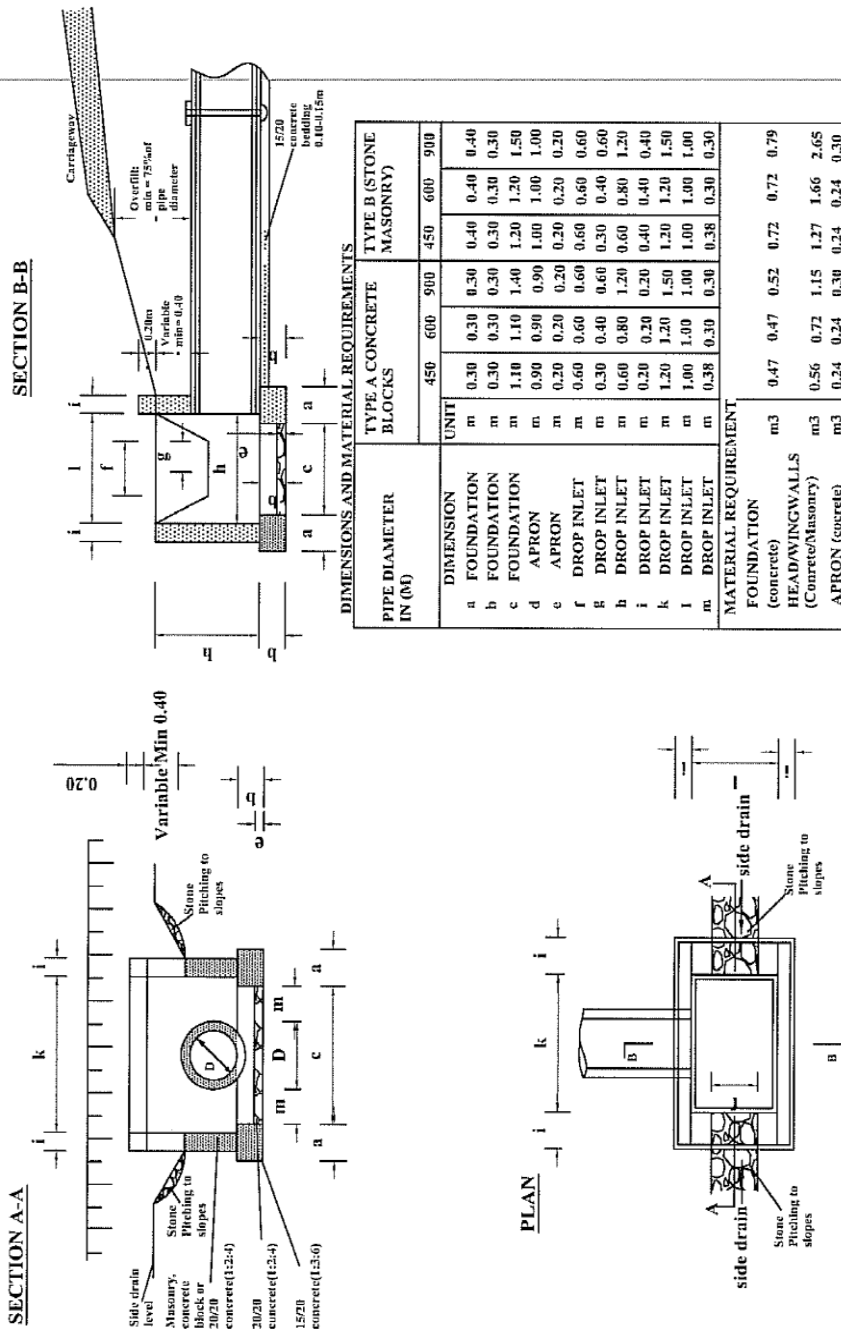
HEADWALL TYPE 1 (HEAD AND WINGWALLS)
